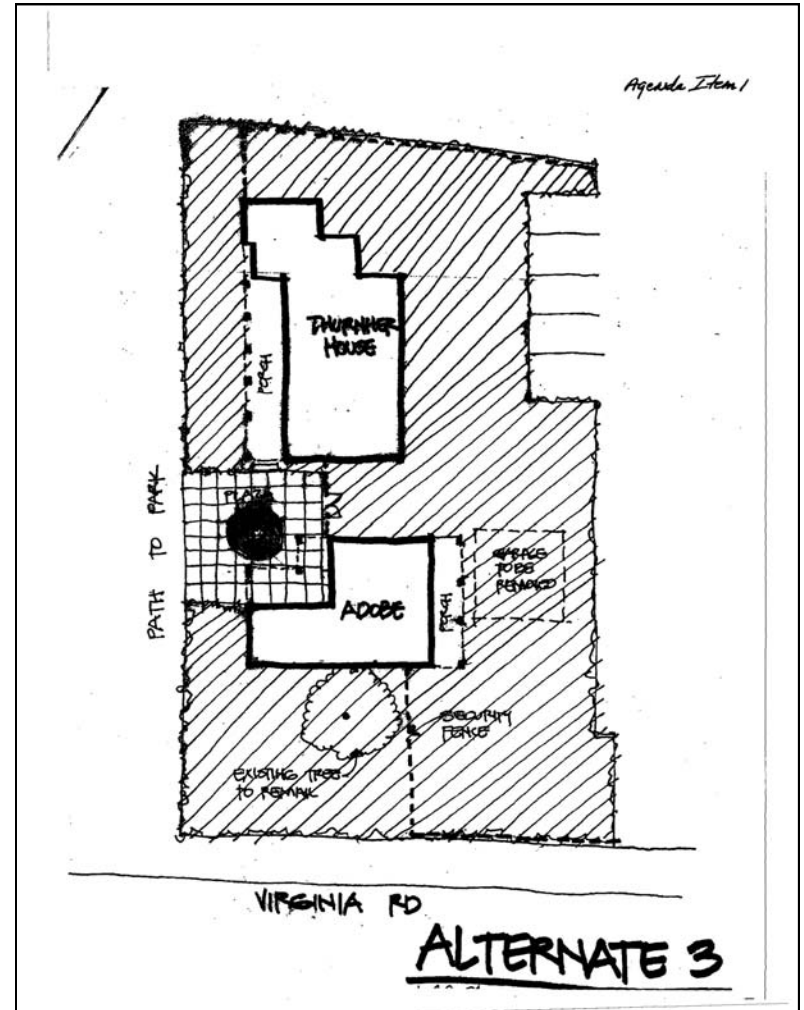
Sketch detailing proposed relocation site within Lacy Park.
